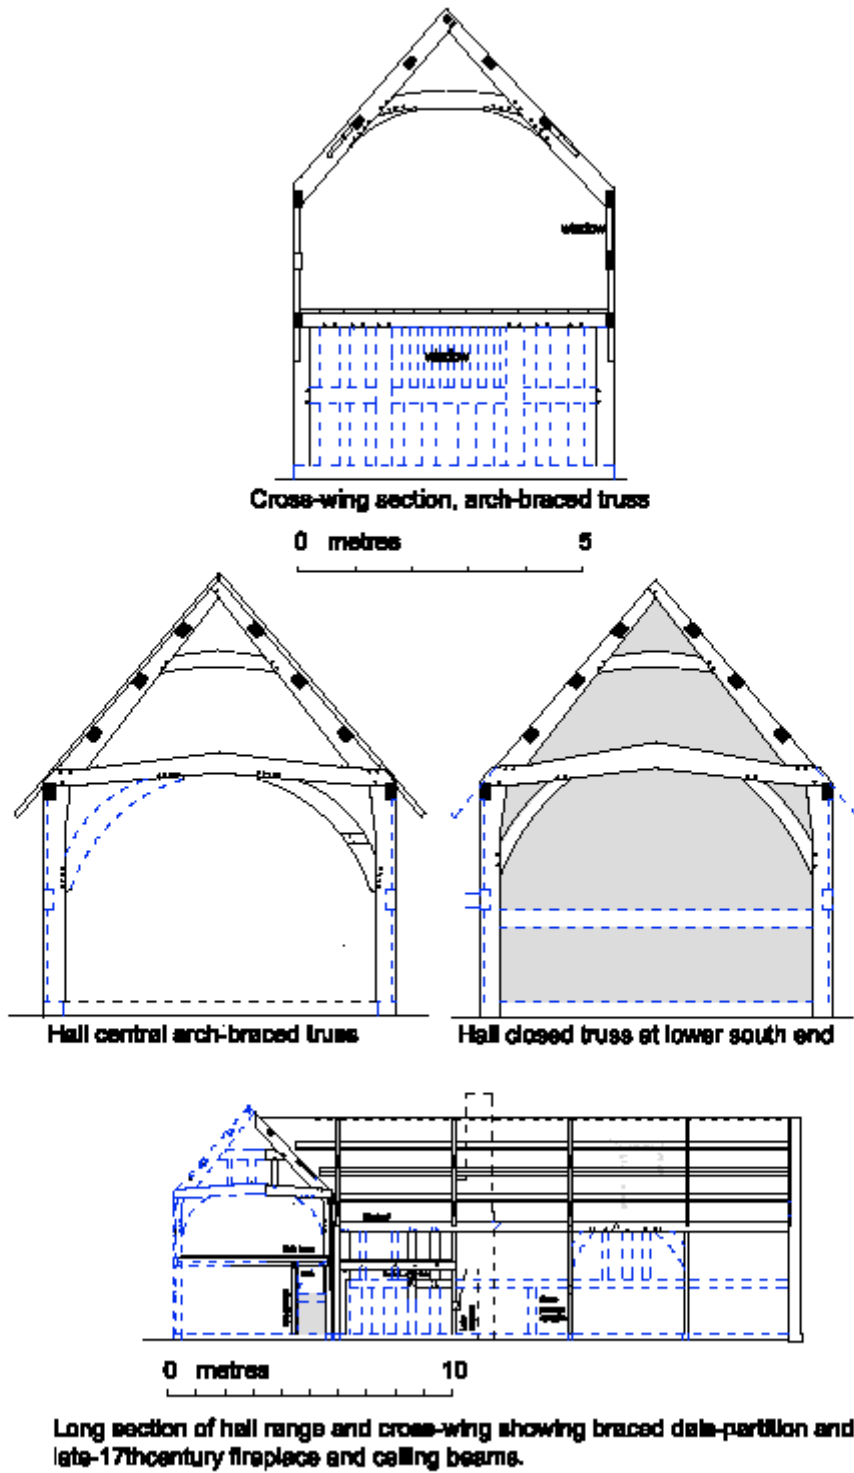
Reconstructed drawings showing the cross-wing arch-braced truss, with ground-floor window to open bay. Also the two hall trusses and a long-section through hall/kitchen/service and cross-wing.
